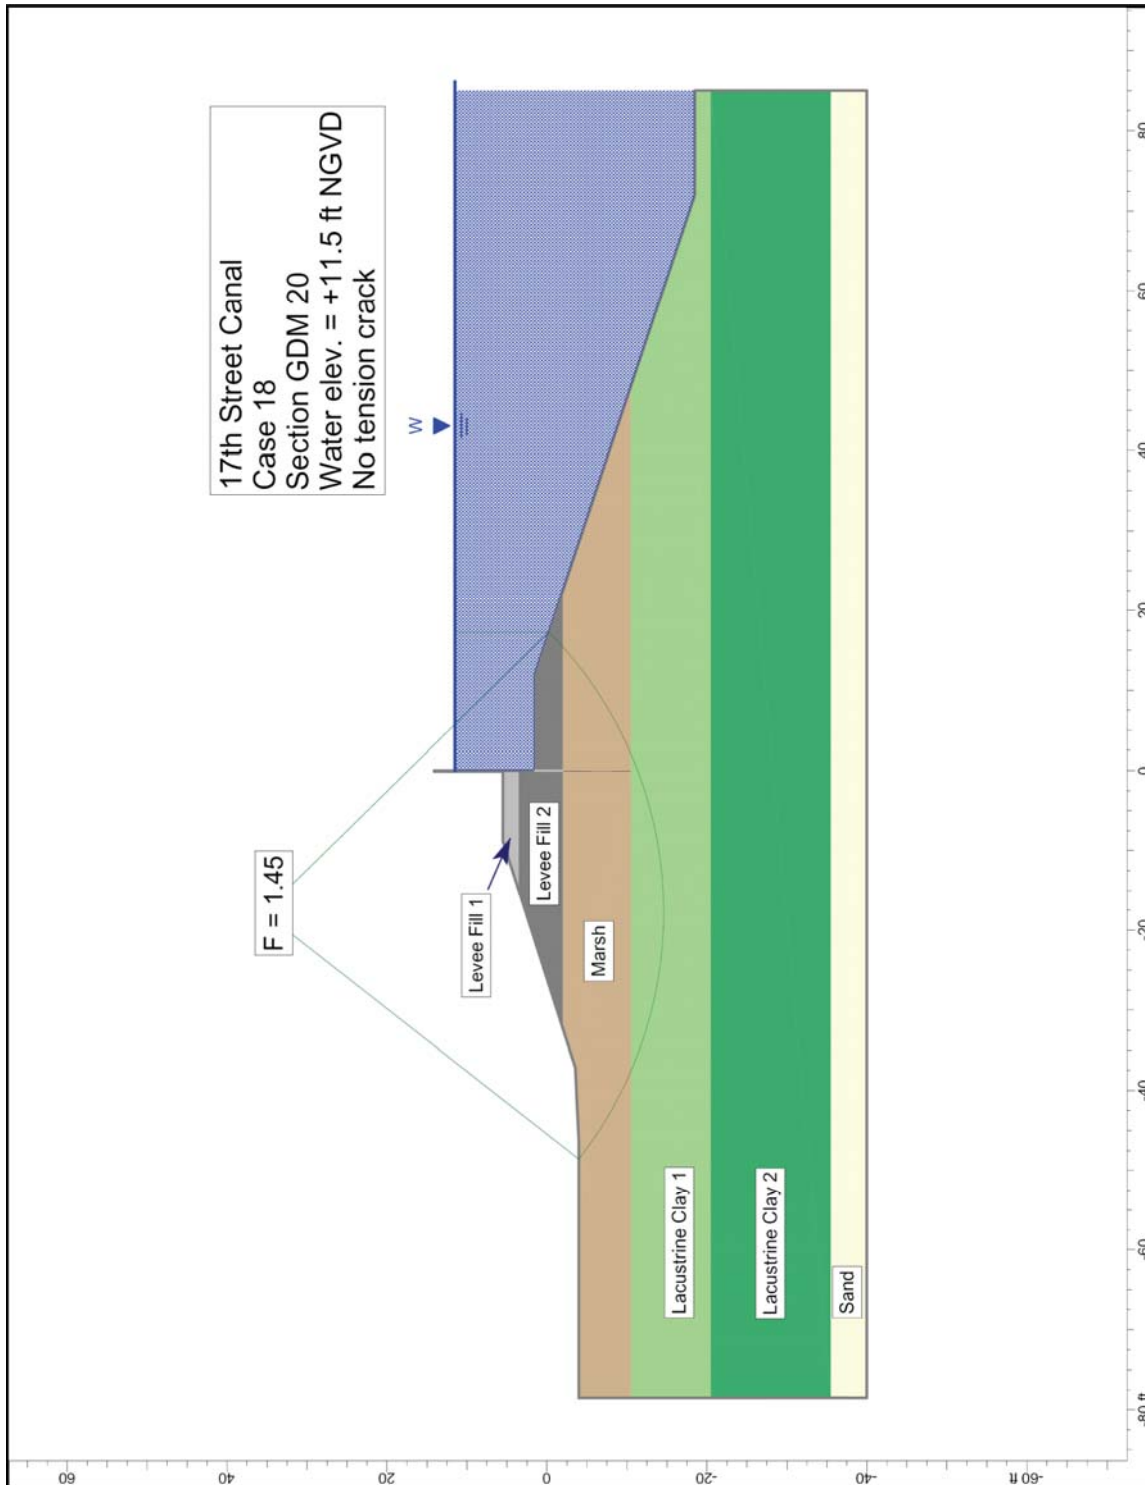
Critical circle for 17th Street Canal Design cross section – water elevation 11.5 ft, no tension crack.
